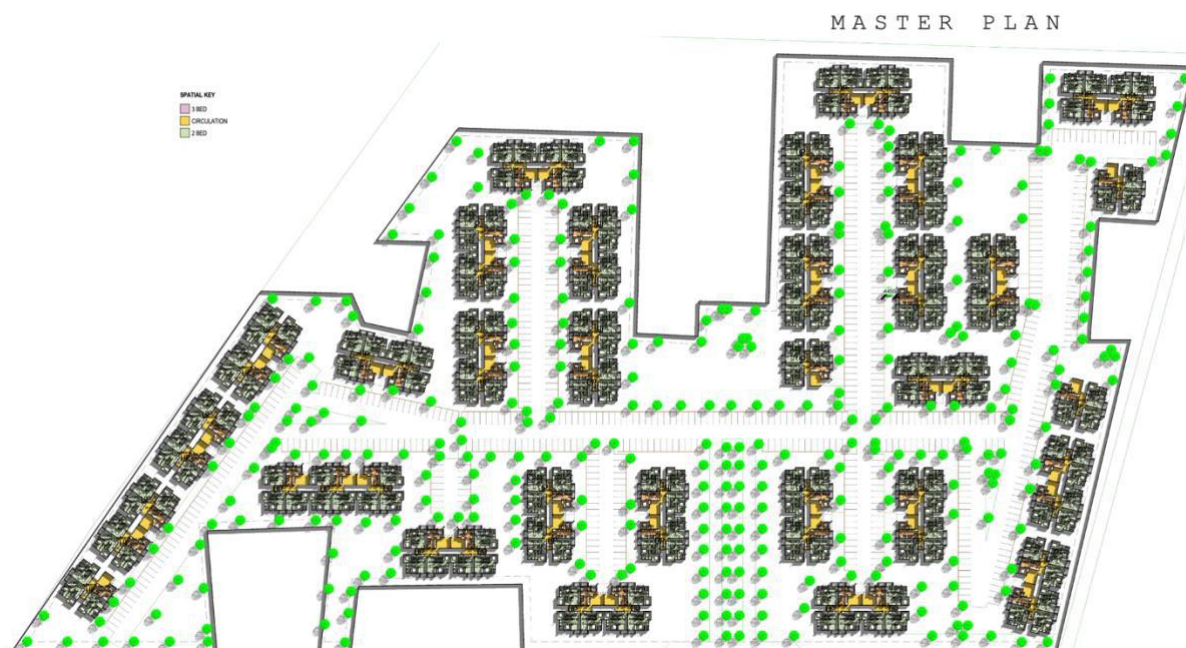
Masterplan of project showing layout of housing blocks & support infrastructure
